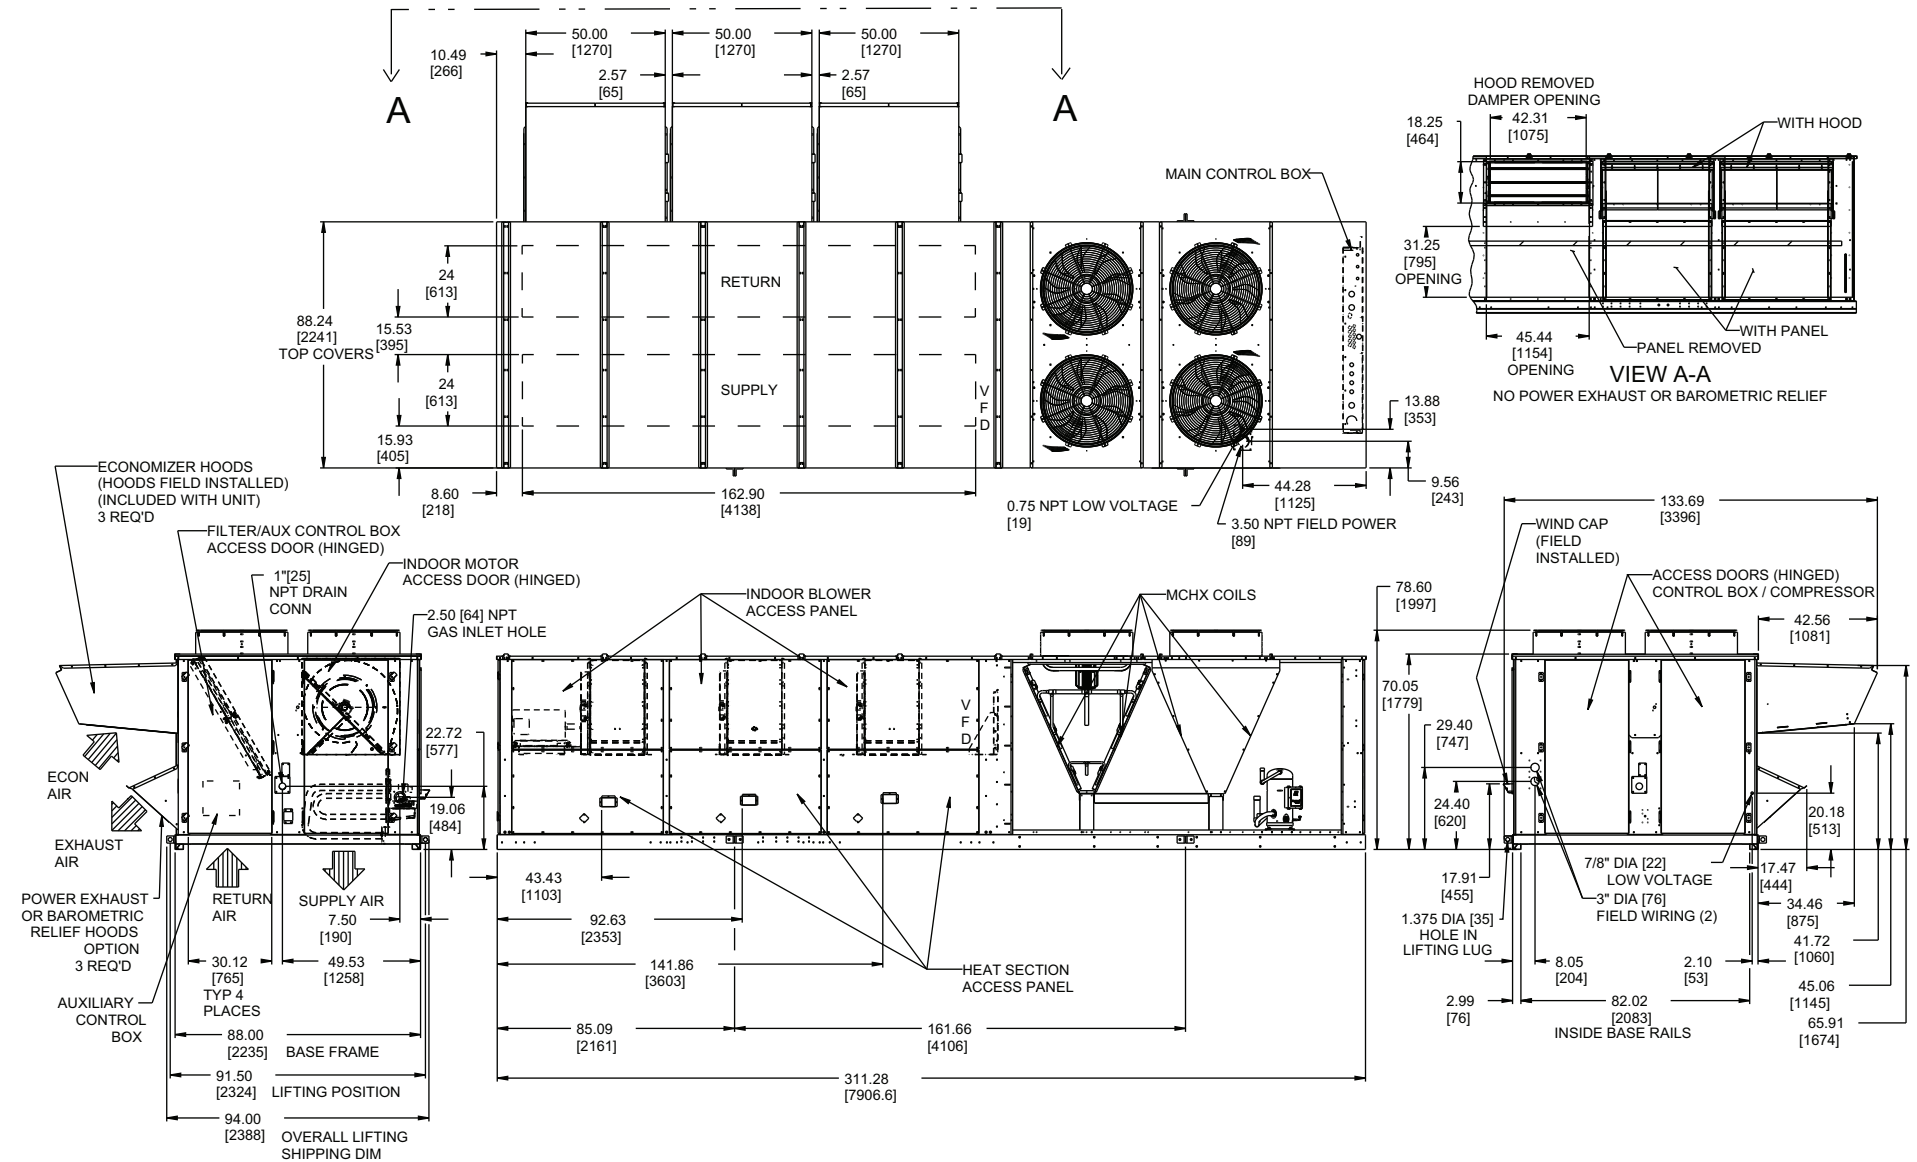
Base Unit Dimensions MCHX, Bottom Supply and Return — 48A2,A3,A6,A7060
